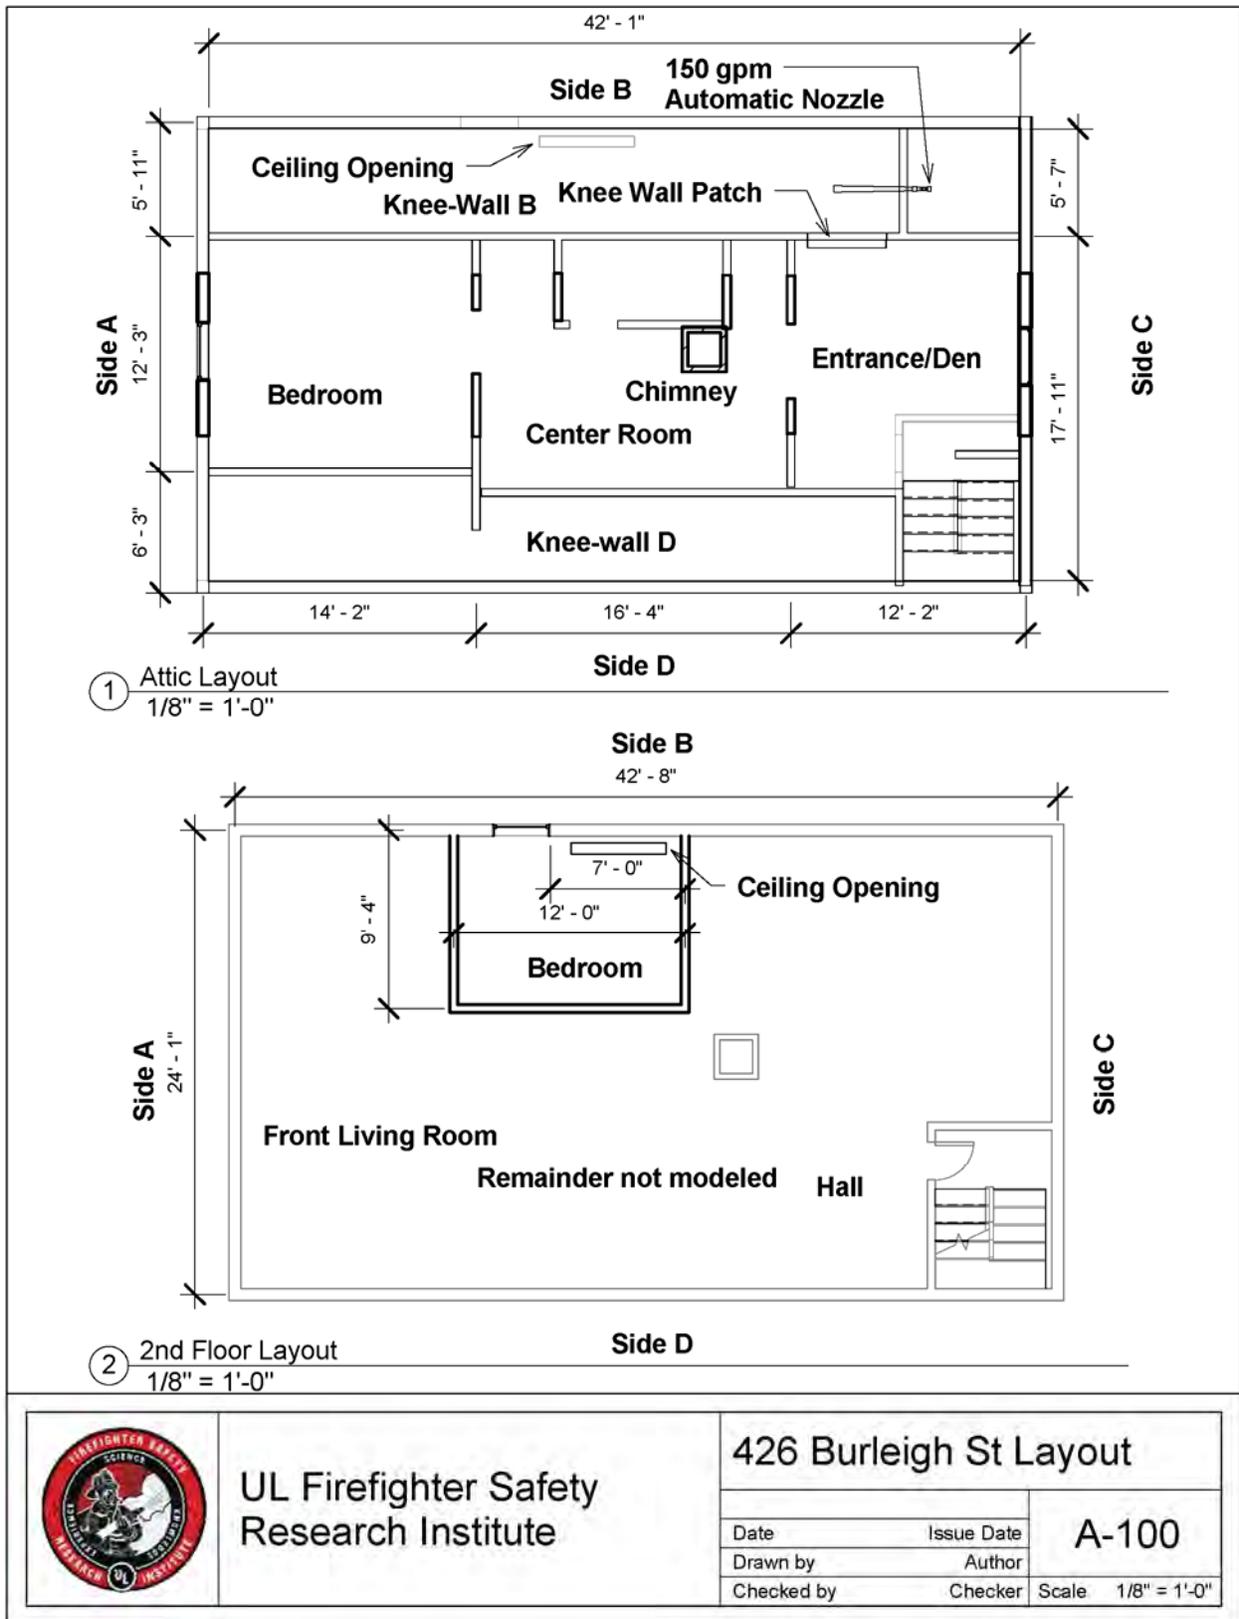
Experiment 2 – 426 Burleigh Street Layout Drawing
